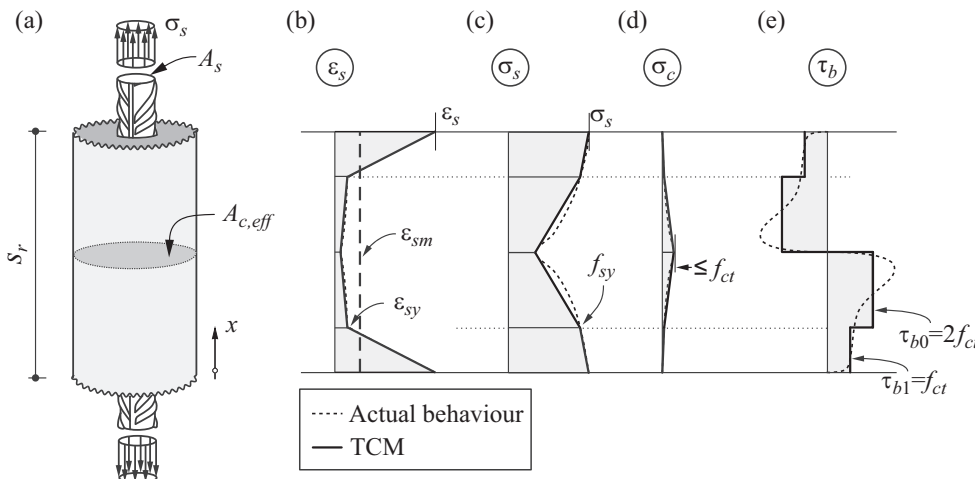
Reinforced concrete under pure tension: (a) crack element bounded by two cracks with crack spacing s_r and effective area of concrete in tension $A_{c,eff}$; (b) steel strain distribution ϵ_s ; (c) steel stress distribution σ_s ; (d) concrete tensile stress distribution σ_c , and (e) bond stress distribution τ_b for presumed actual behaviour (dashed lines) and simplified according to the tension chord model (TCM) (solid lines)
